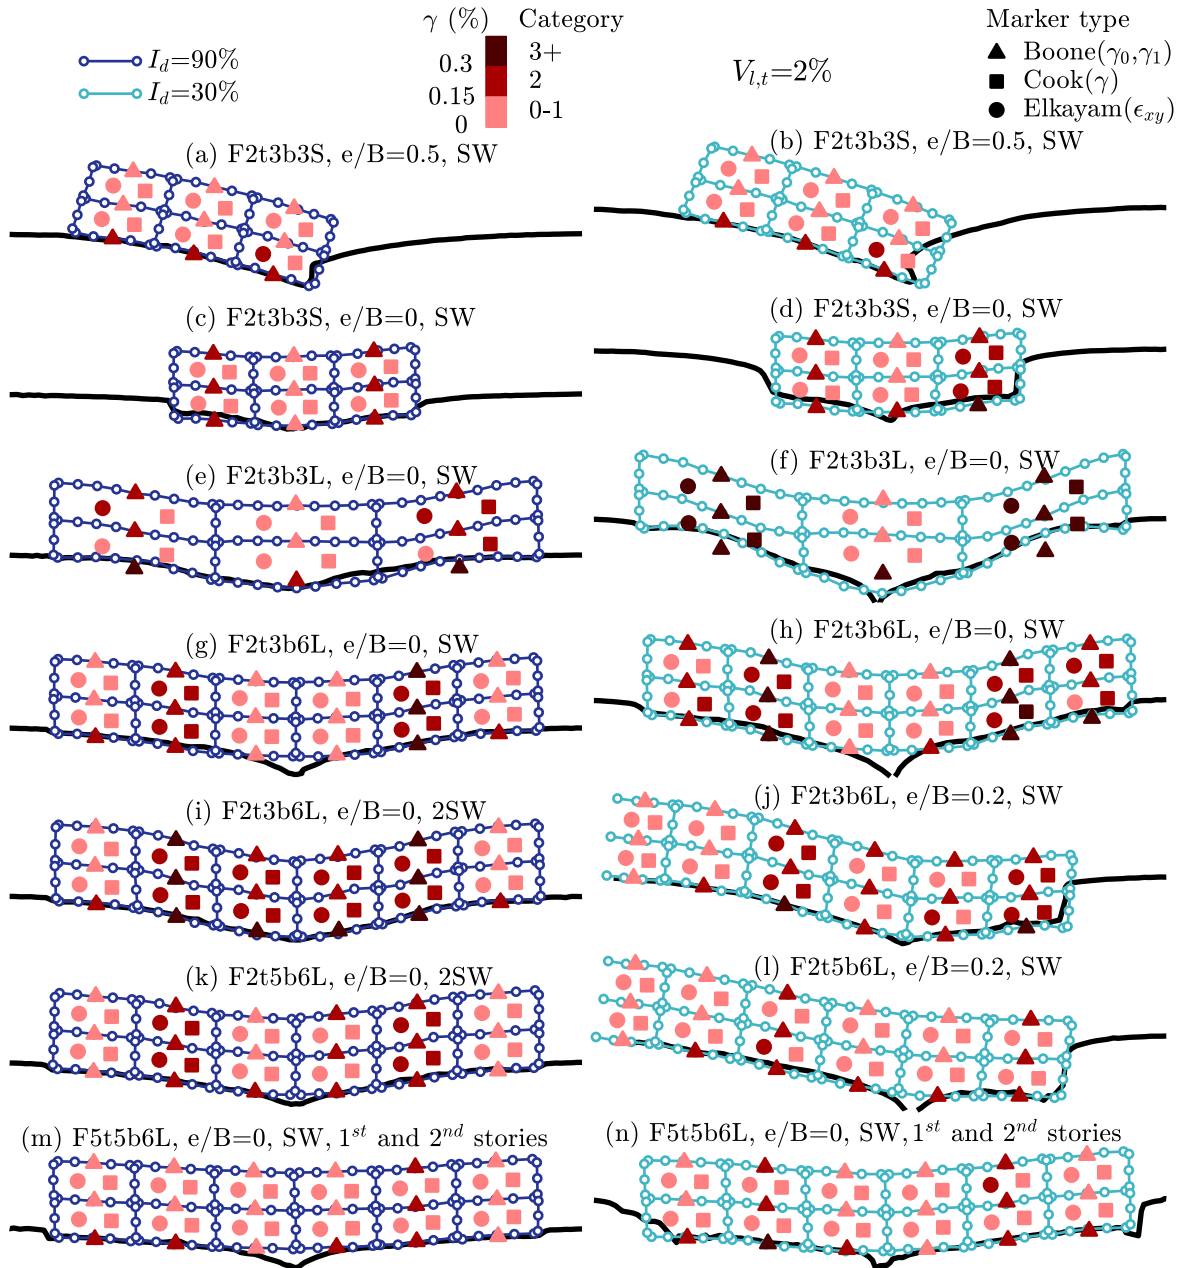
Post-tunneling frame deformed shapes and level of damage (scale factor: 100); left column is dense sand tests, right column is loose sand tests.
